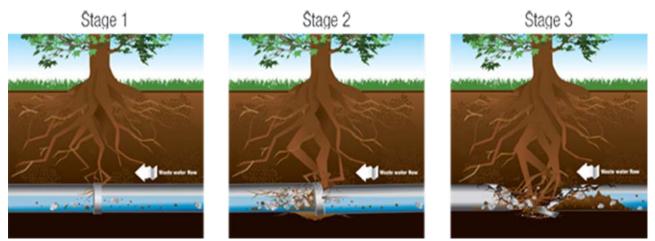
shows how a tree or shrub root enters a sewer pipe (Stage 1), how it causes a blockage in a sewer pipe (Stage 2) and how it will ultimately break the sewer pipe (Stage 3).
